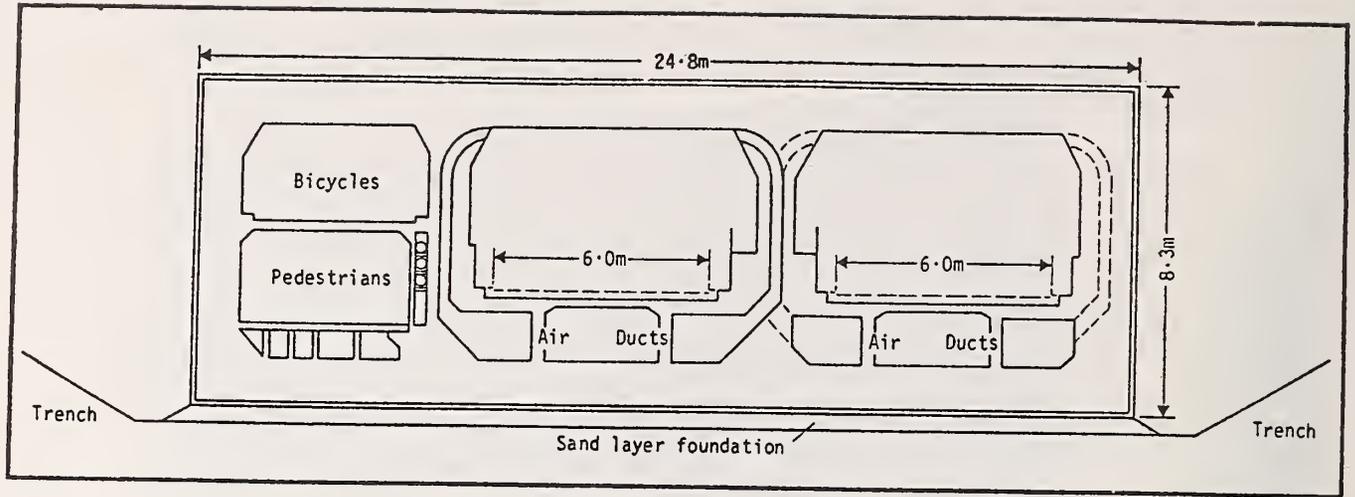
CROSS SECTION OF THE MAAS TUNNEL, ROTTERDAM
